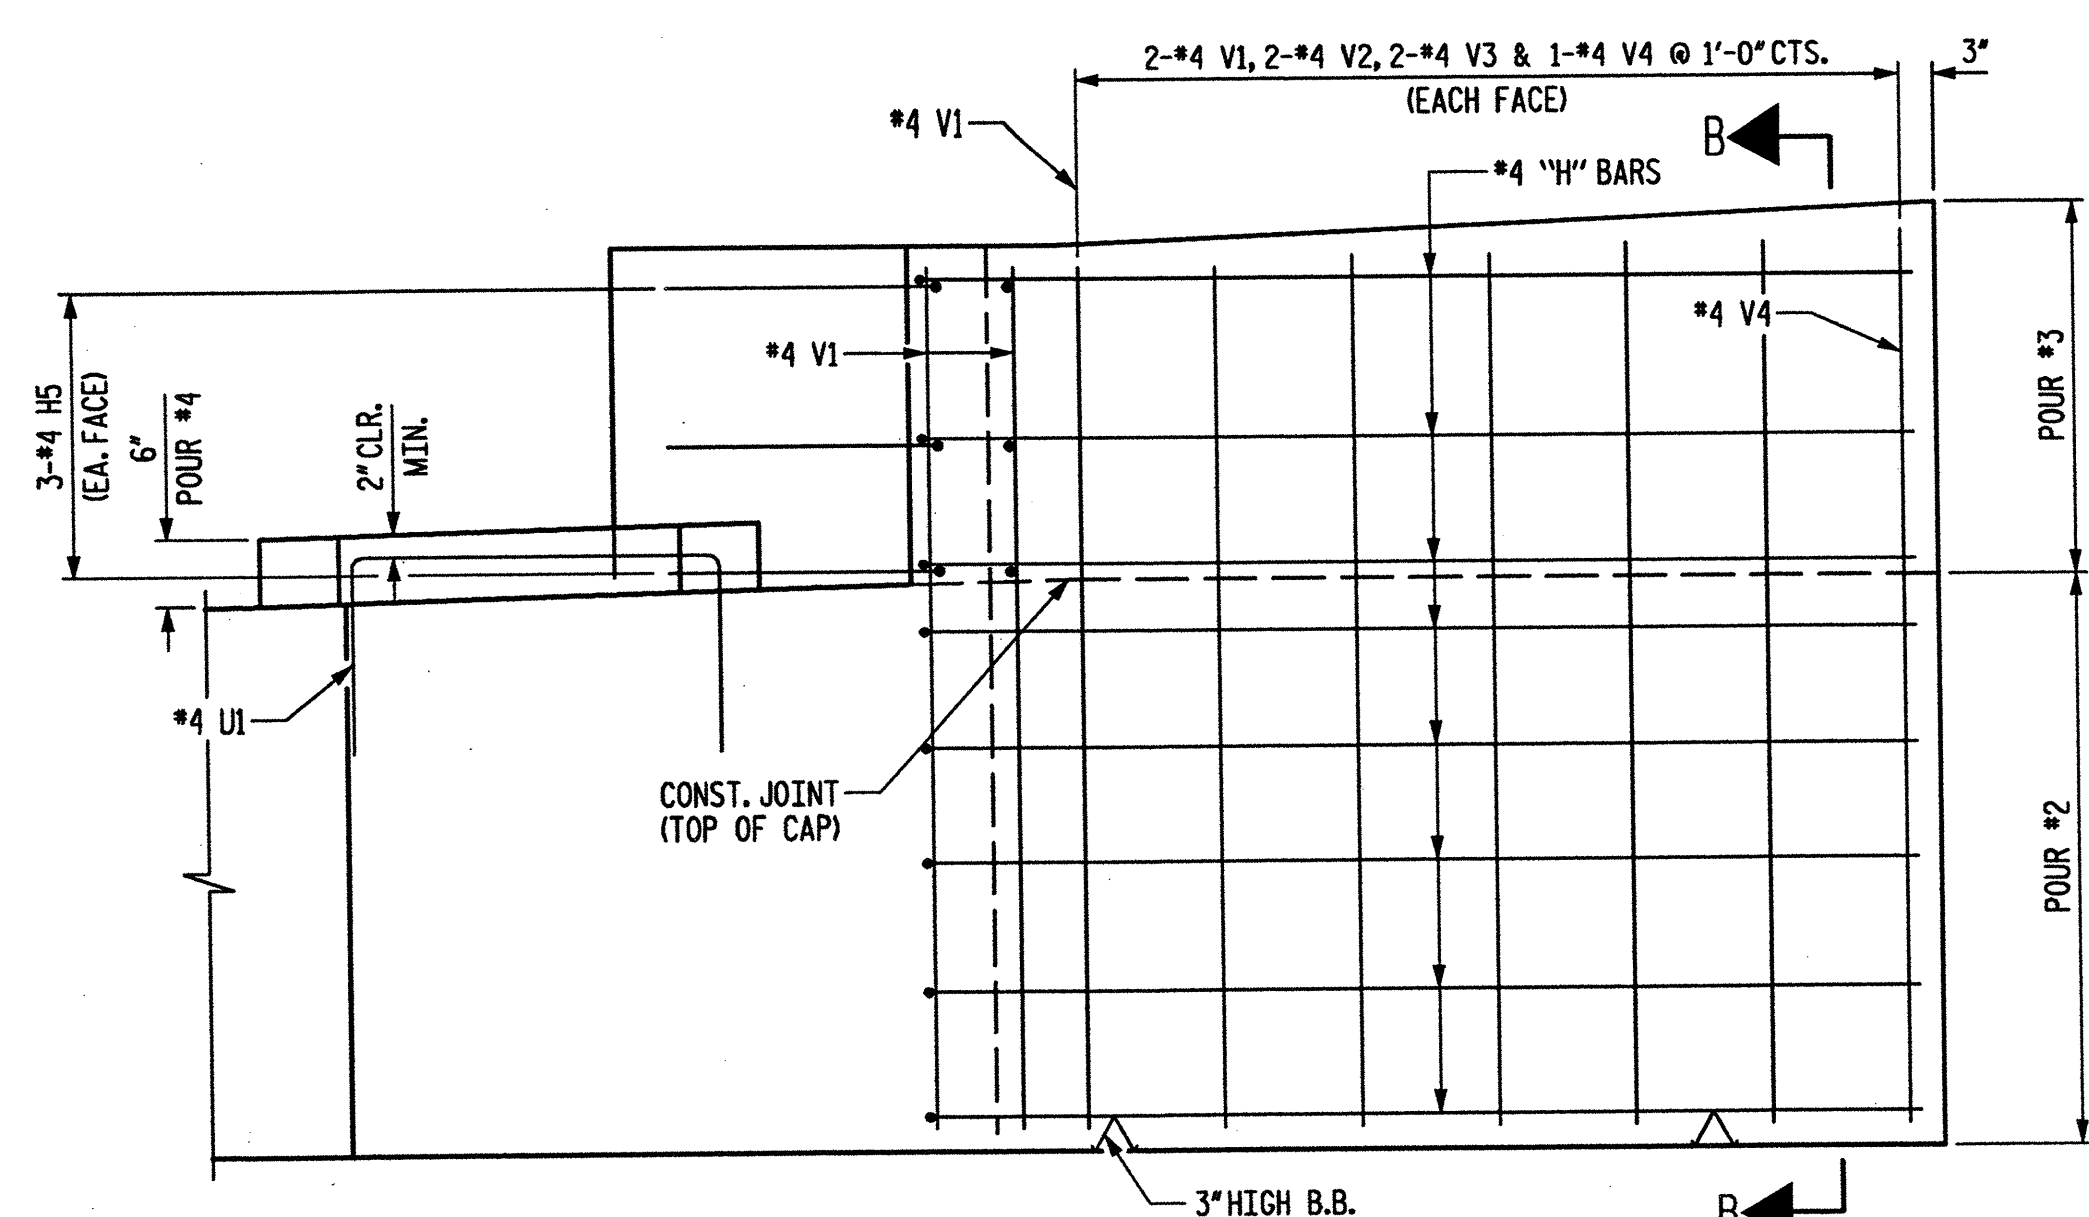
DETAIL OF RECESS IN TOP BACKWALL AT WING W2
